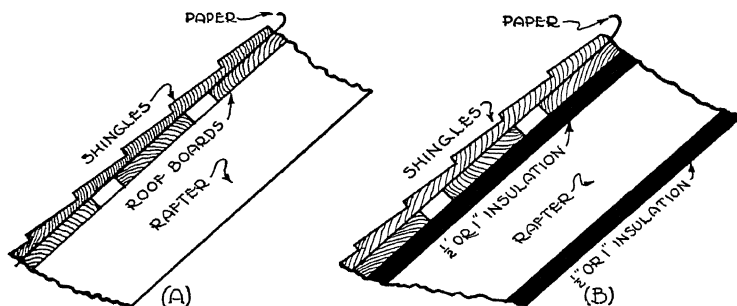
Roof Section Showing (A) No Insulation and (B) Recommended Rigid Insulation
